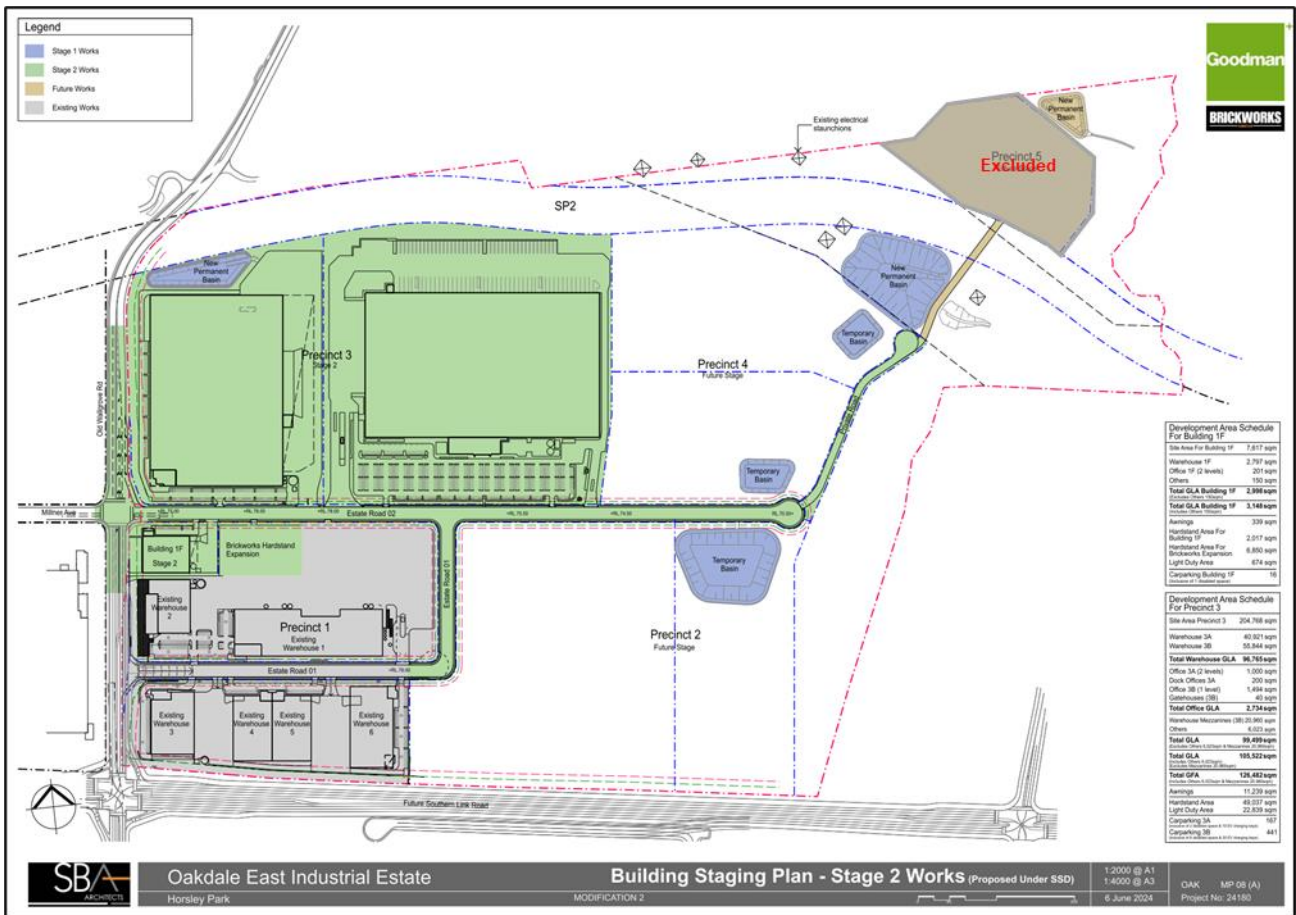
Oakdale East Industrial Estate Building Staging Plan
